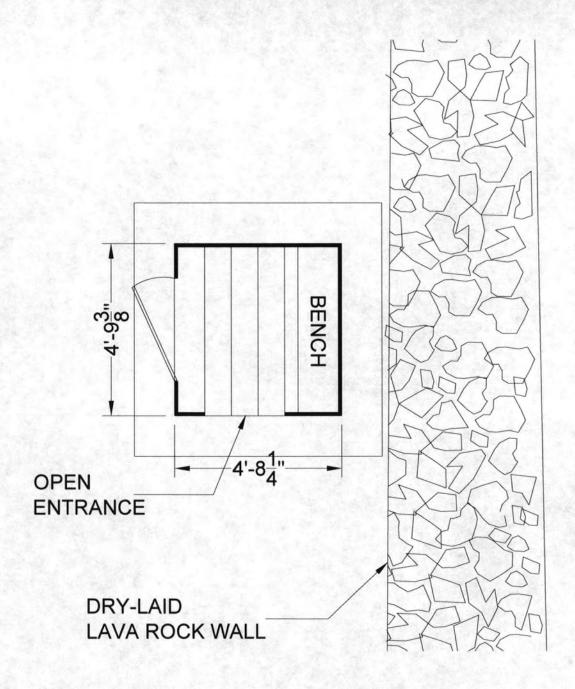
FIGURE I - BUILDING 5, BUS STOP/OUTHOUSE SHED FLOOR PLAN
